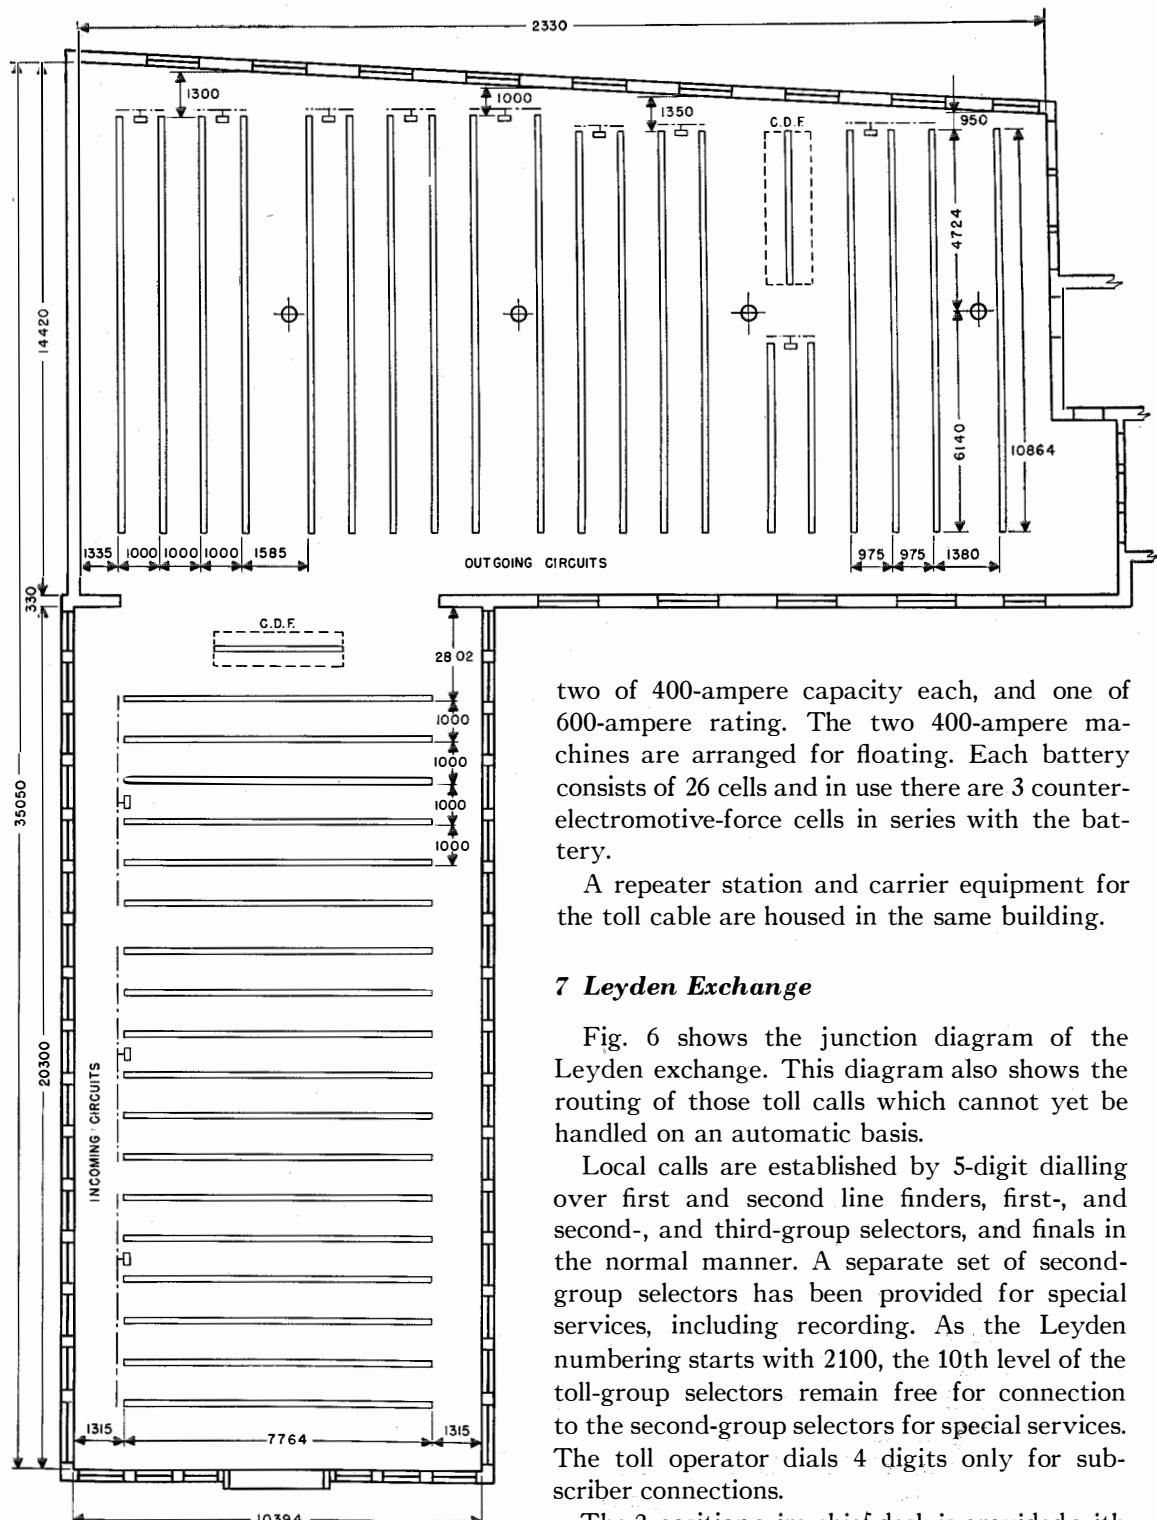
Floor plan of the automatic switch room in The Hague main district exchange.
